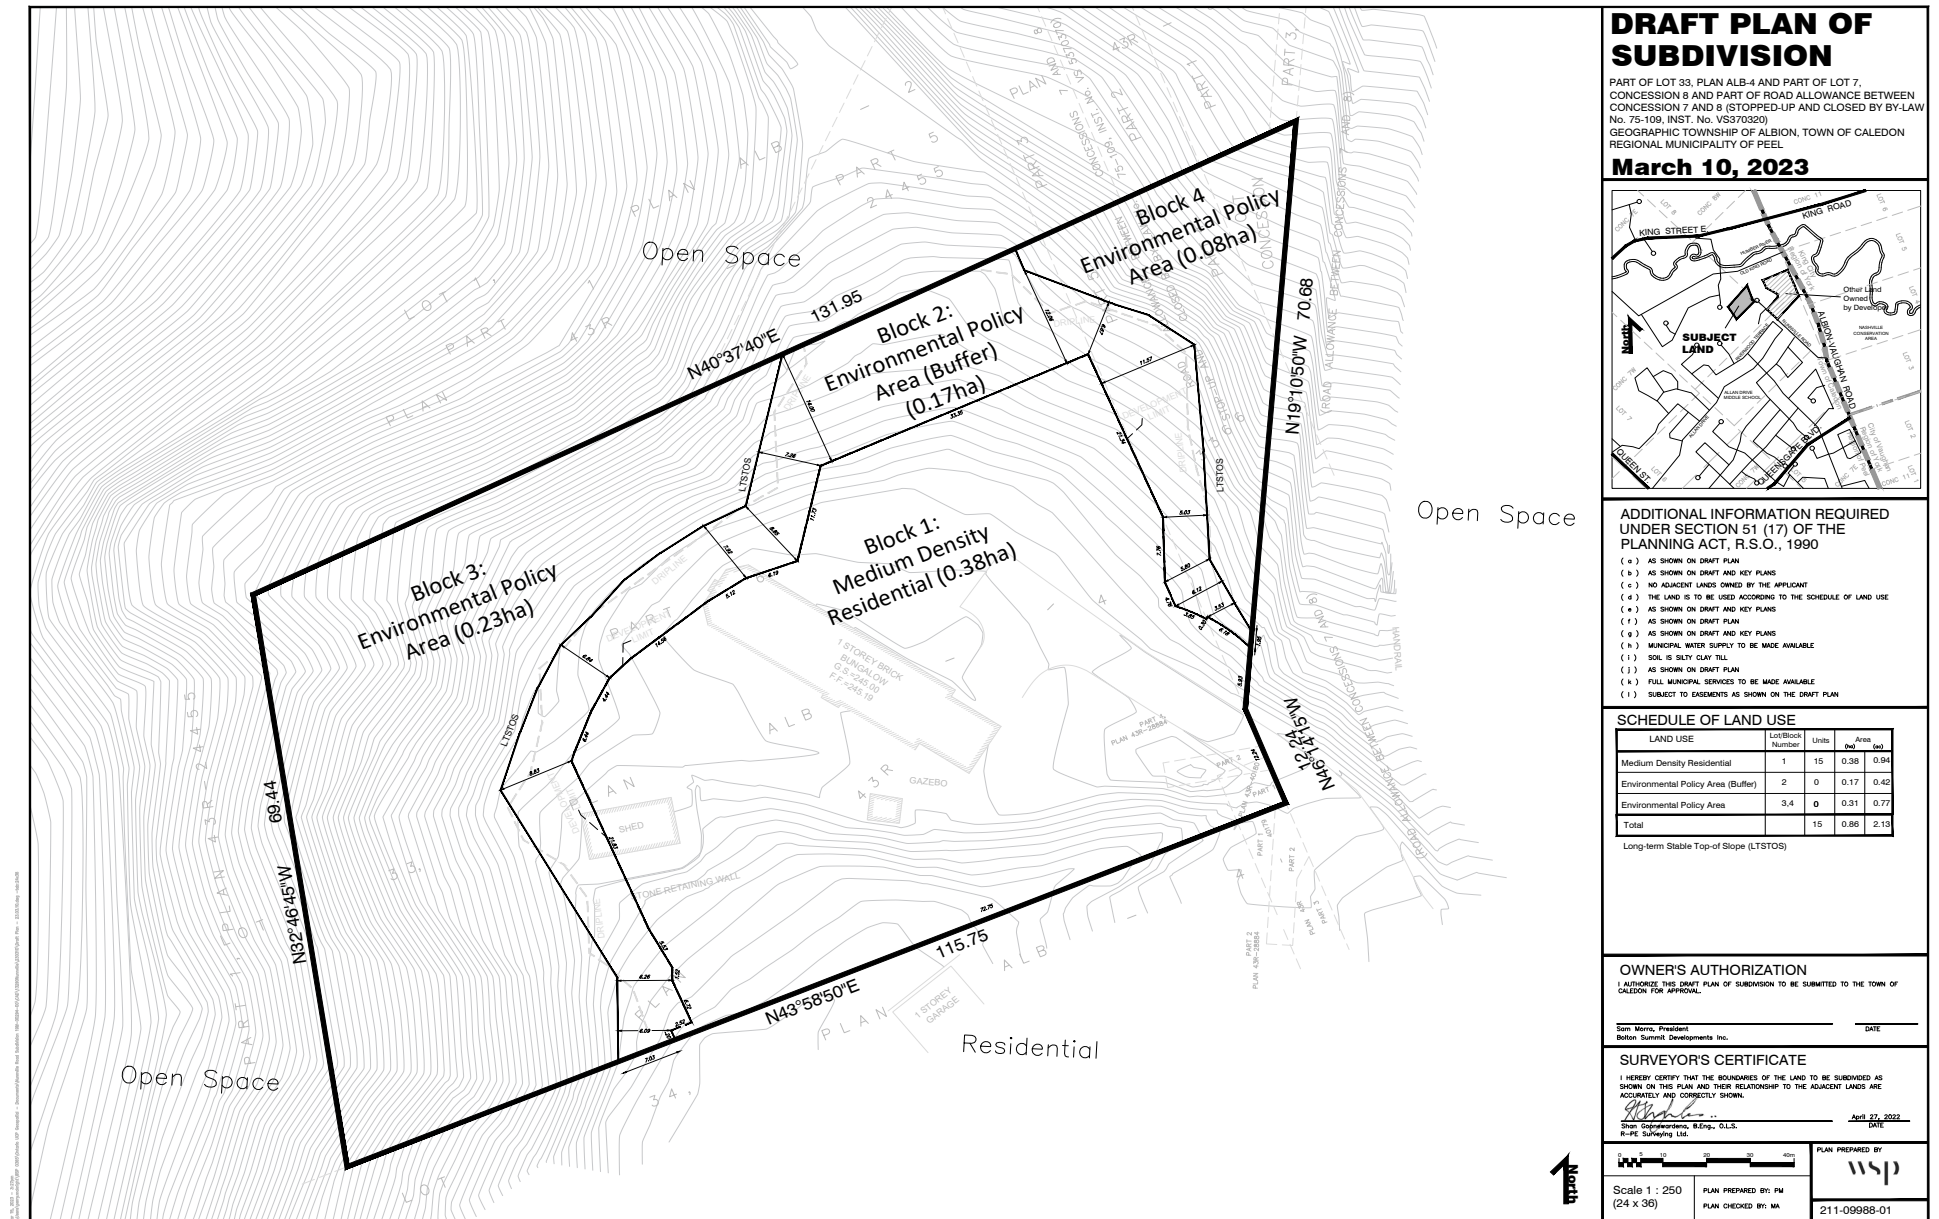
13290 Nunnville Road Draft Plan of Subdivision prepared by WSP (January 2023)
